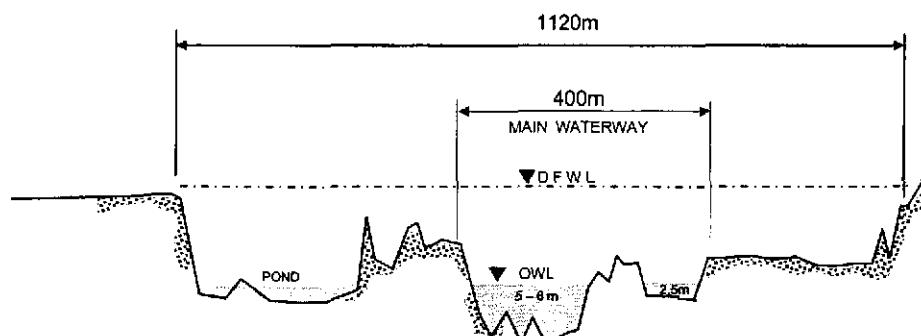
ANGAT RIVER SECTION AT PROPOSED SITE LOCATION
